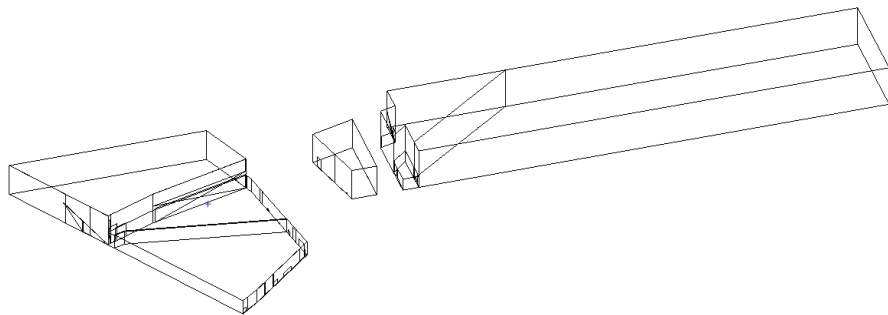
F2050 Reconstruction from 30mm voxel filtered ground floor scans
